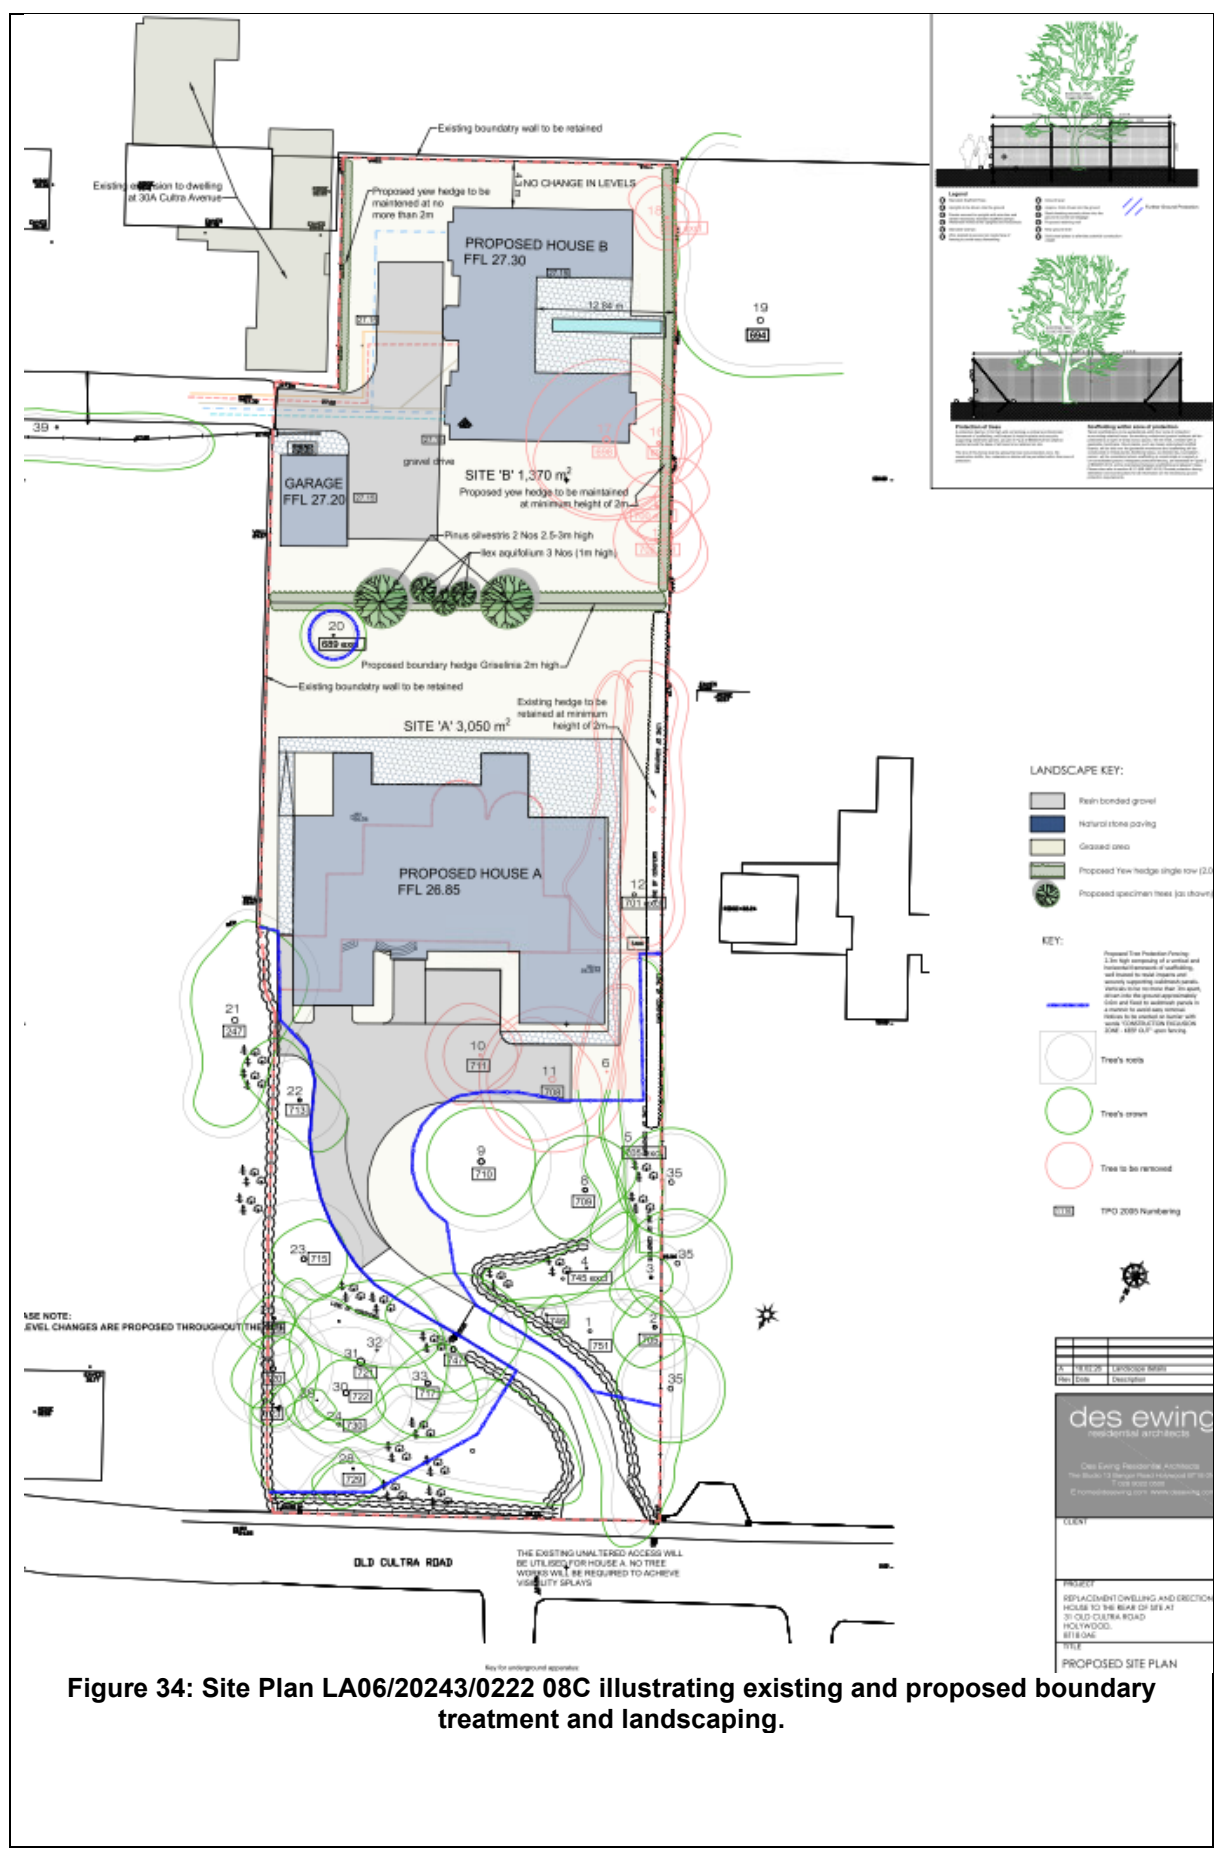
Site Plan LA06/20243/0222 08C illustrating existing and proposed boundary treatment and landscaping.
